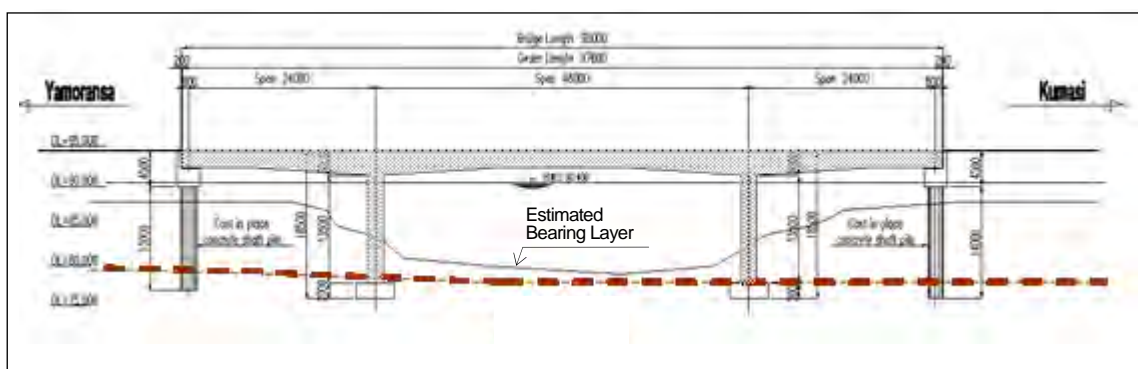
Bridge Pier and Abutment Location and Estimated Line of Supporting Base
